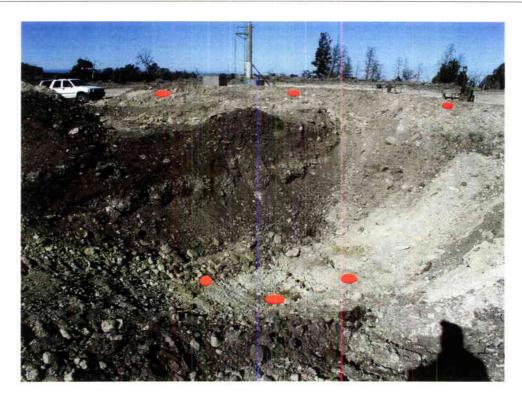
Pit 2 and Pile 1 Sampling Locations 10-24-01 (from Location G on Schematic)
